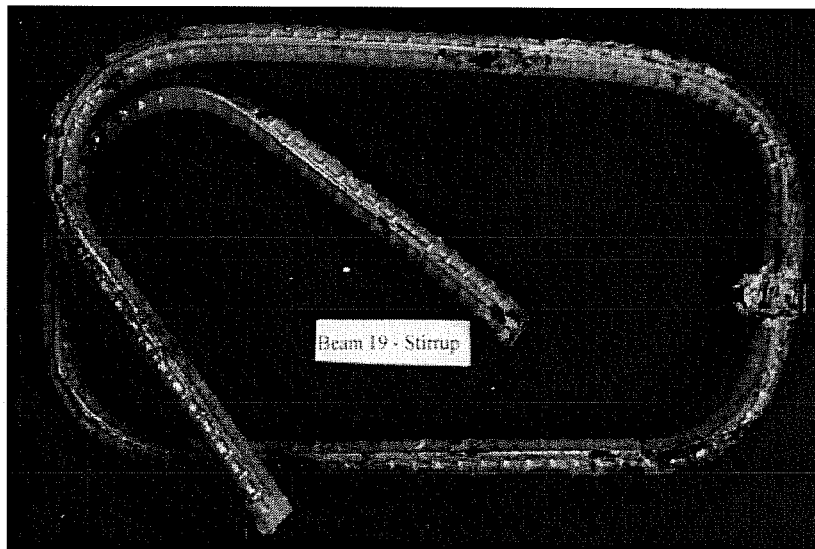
Corrosion Damage on Stirrup (Beam 19).
